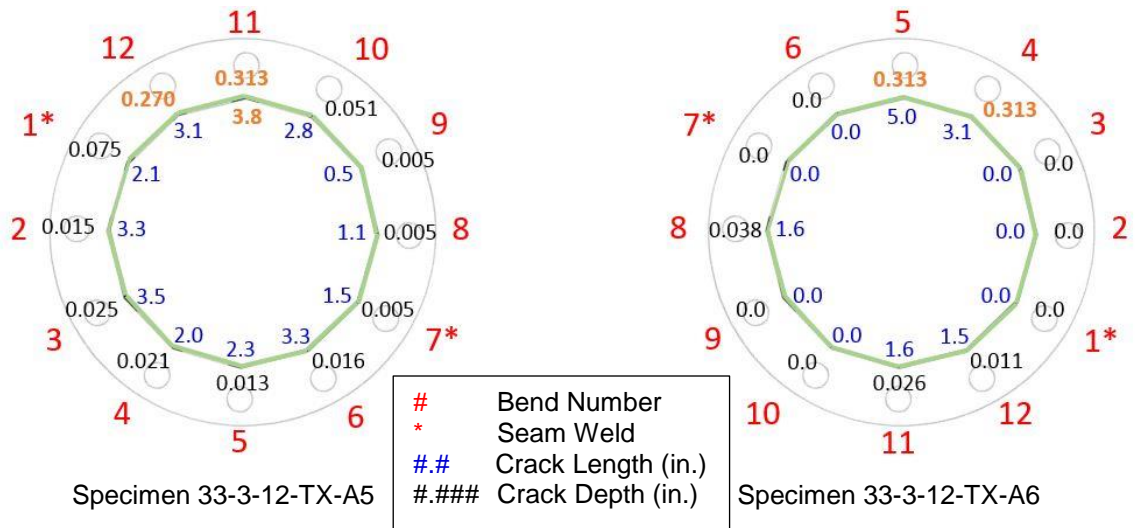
Specimens 33-3-12-TX-A5 and 33-3-12-TX-A6: Cracks after 16.8 Million Fatigue Cycles
